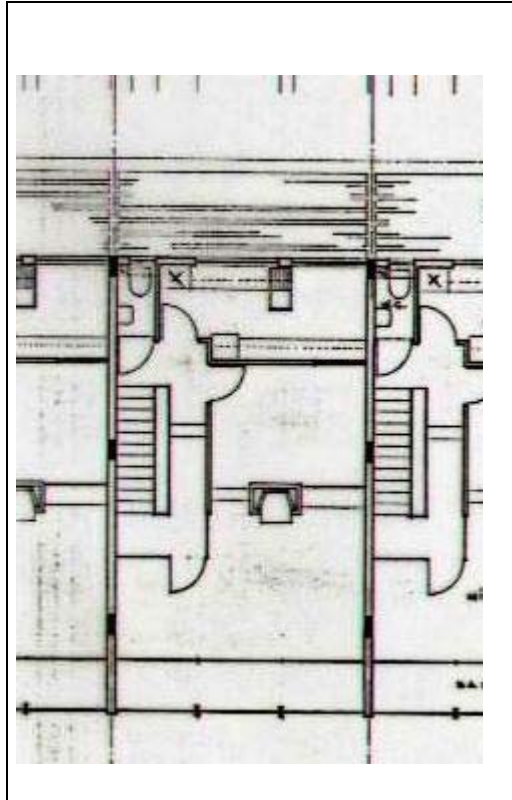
First floor plan, Row Houses. Ahmed Behaeddin.
